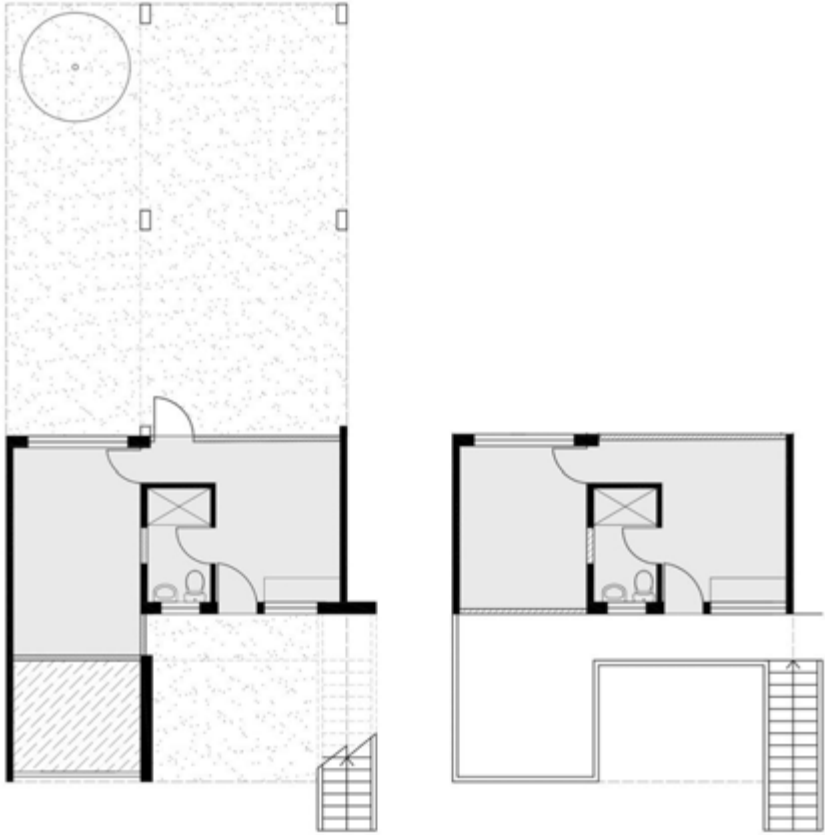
The ground and first floor plans of a row-house before any extensions or alterations are made to the unit.
